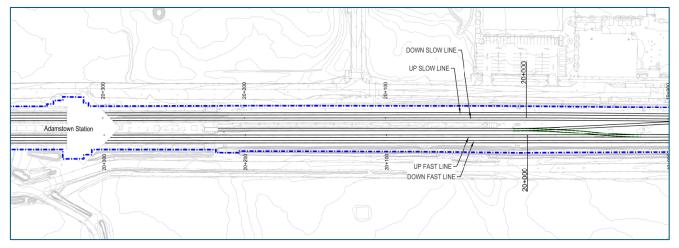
Adamstown Station – Track Plan Layout (1 of 2)
